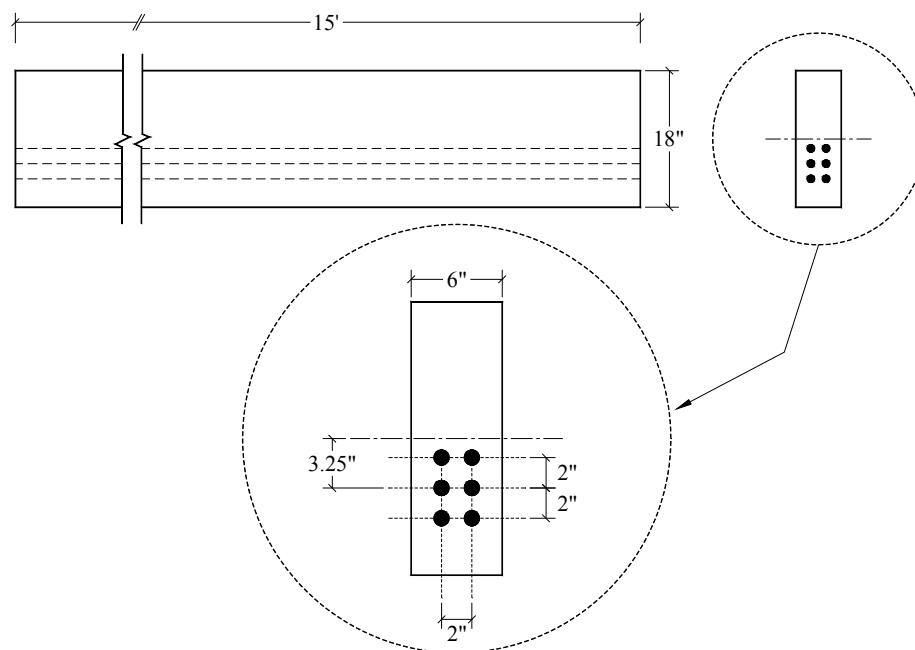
Test Specimen Cross-Section and Length for First Cast
